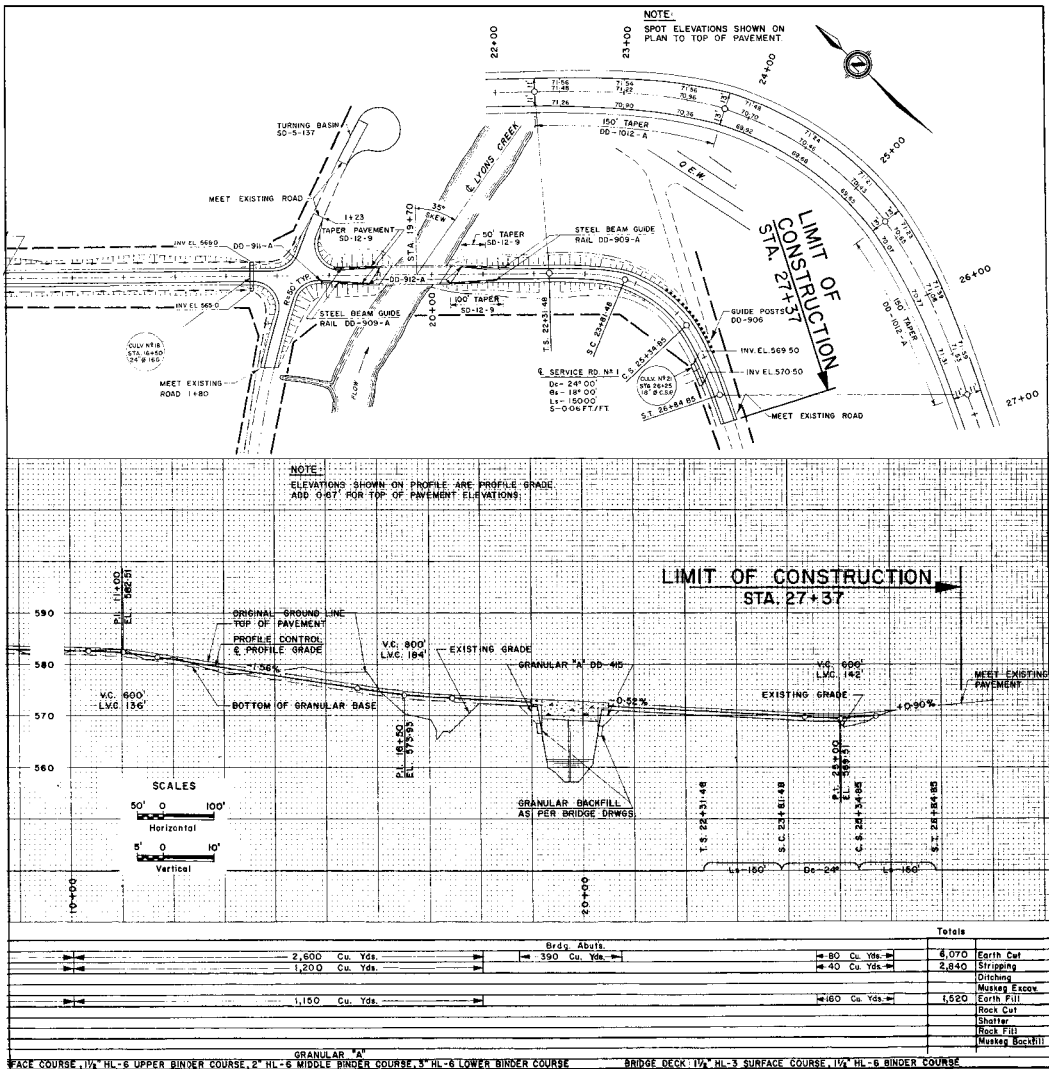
Plan and profile showing horizontal and vertical alignment, including pavement elevations through the superelevated section, cumulative quantities, and toe of slope locations.
